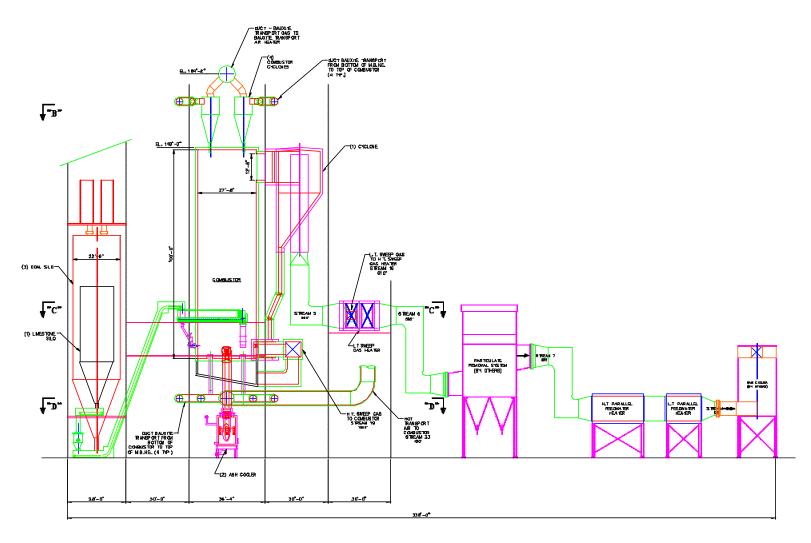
2: Case-6 Boiler Island General Arrangement Drawing – Side Elevation
